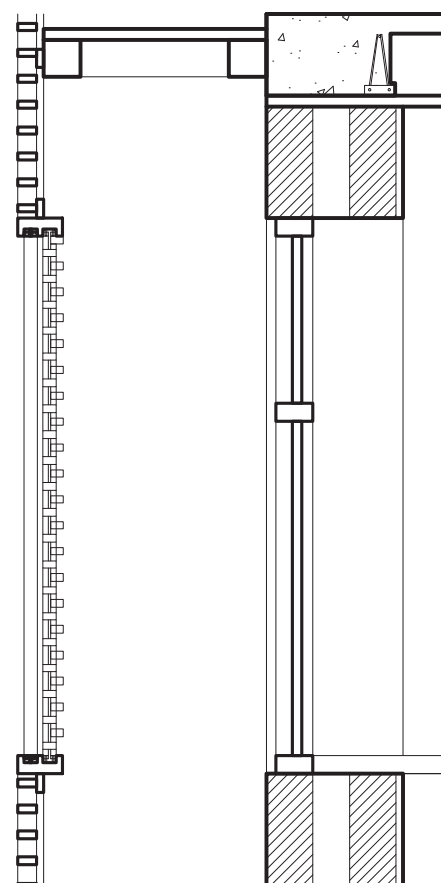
Detail Section of the block façade, with the concrete structure, the brick envelope and the timber shading system.
